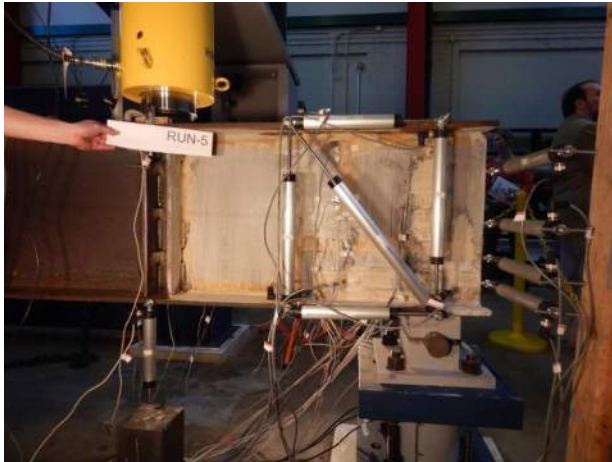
Damaged Girder Left: 40 kip
